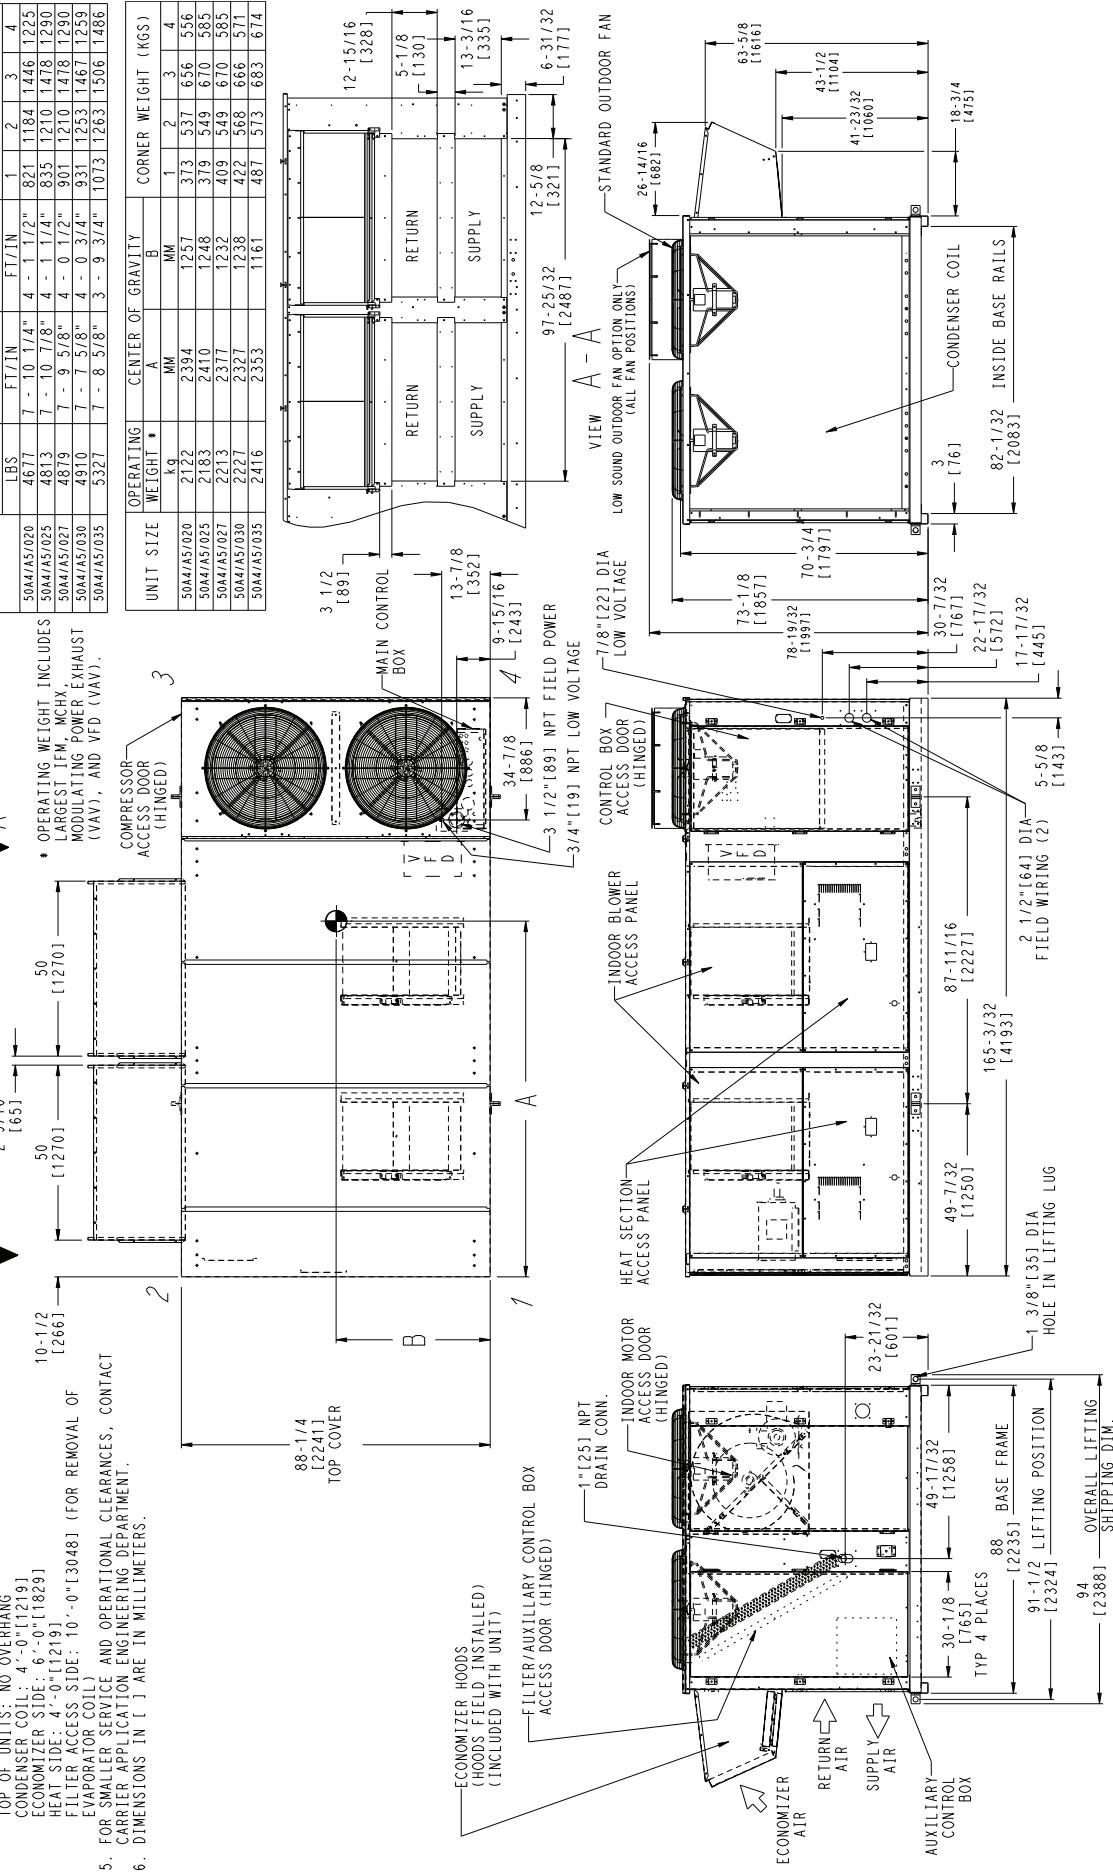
Base Unit Dimensions — 50A4,A5020-035
